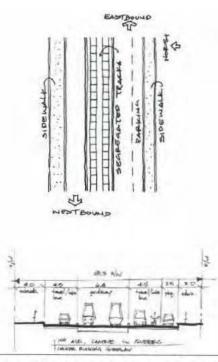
Southeast False Creek – Centre Running Streetcar Option
